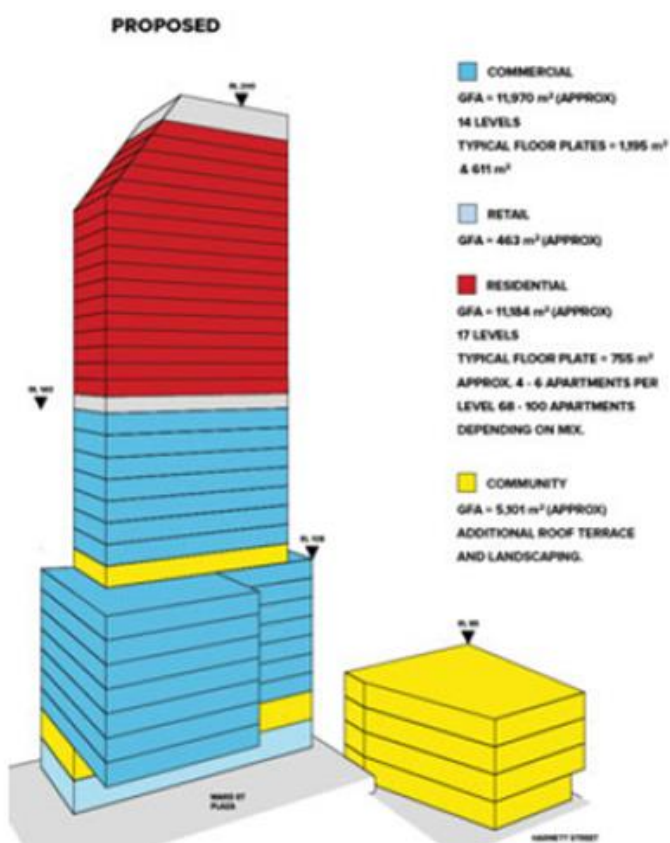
The proposed envelopes envisaged on the Ward Street car park, comprising a mixed use building (left) and community building (right) around a public square (centre).
